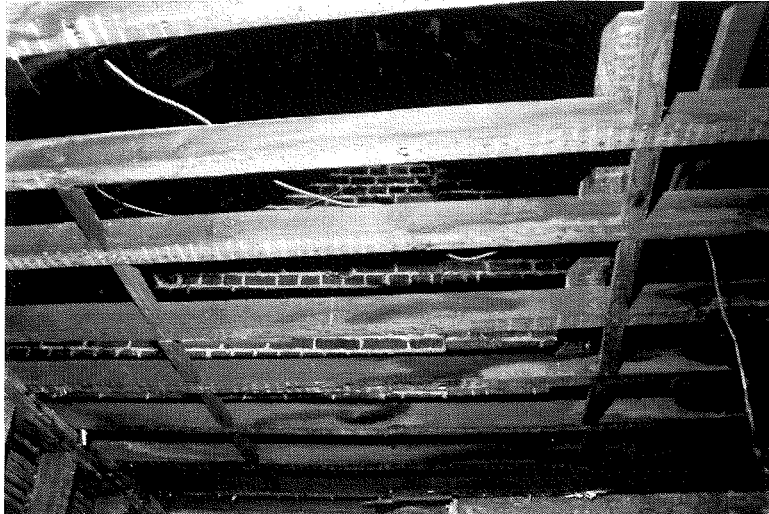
Brickwork in roof-space, concealed behind ceiling timbers
